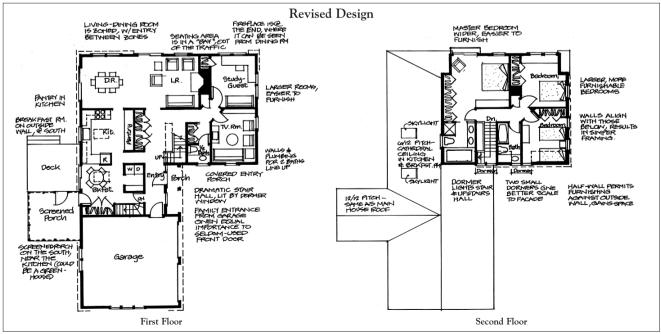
In this revised plan, rearranging the entry, stairway, and living room improve the traffic patterns on the first floor. Locating the covered porch off the kitchen makes it more convenient. Changes to the second floor add space and simplify the framing.
